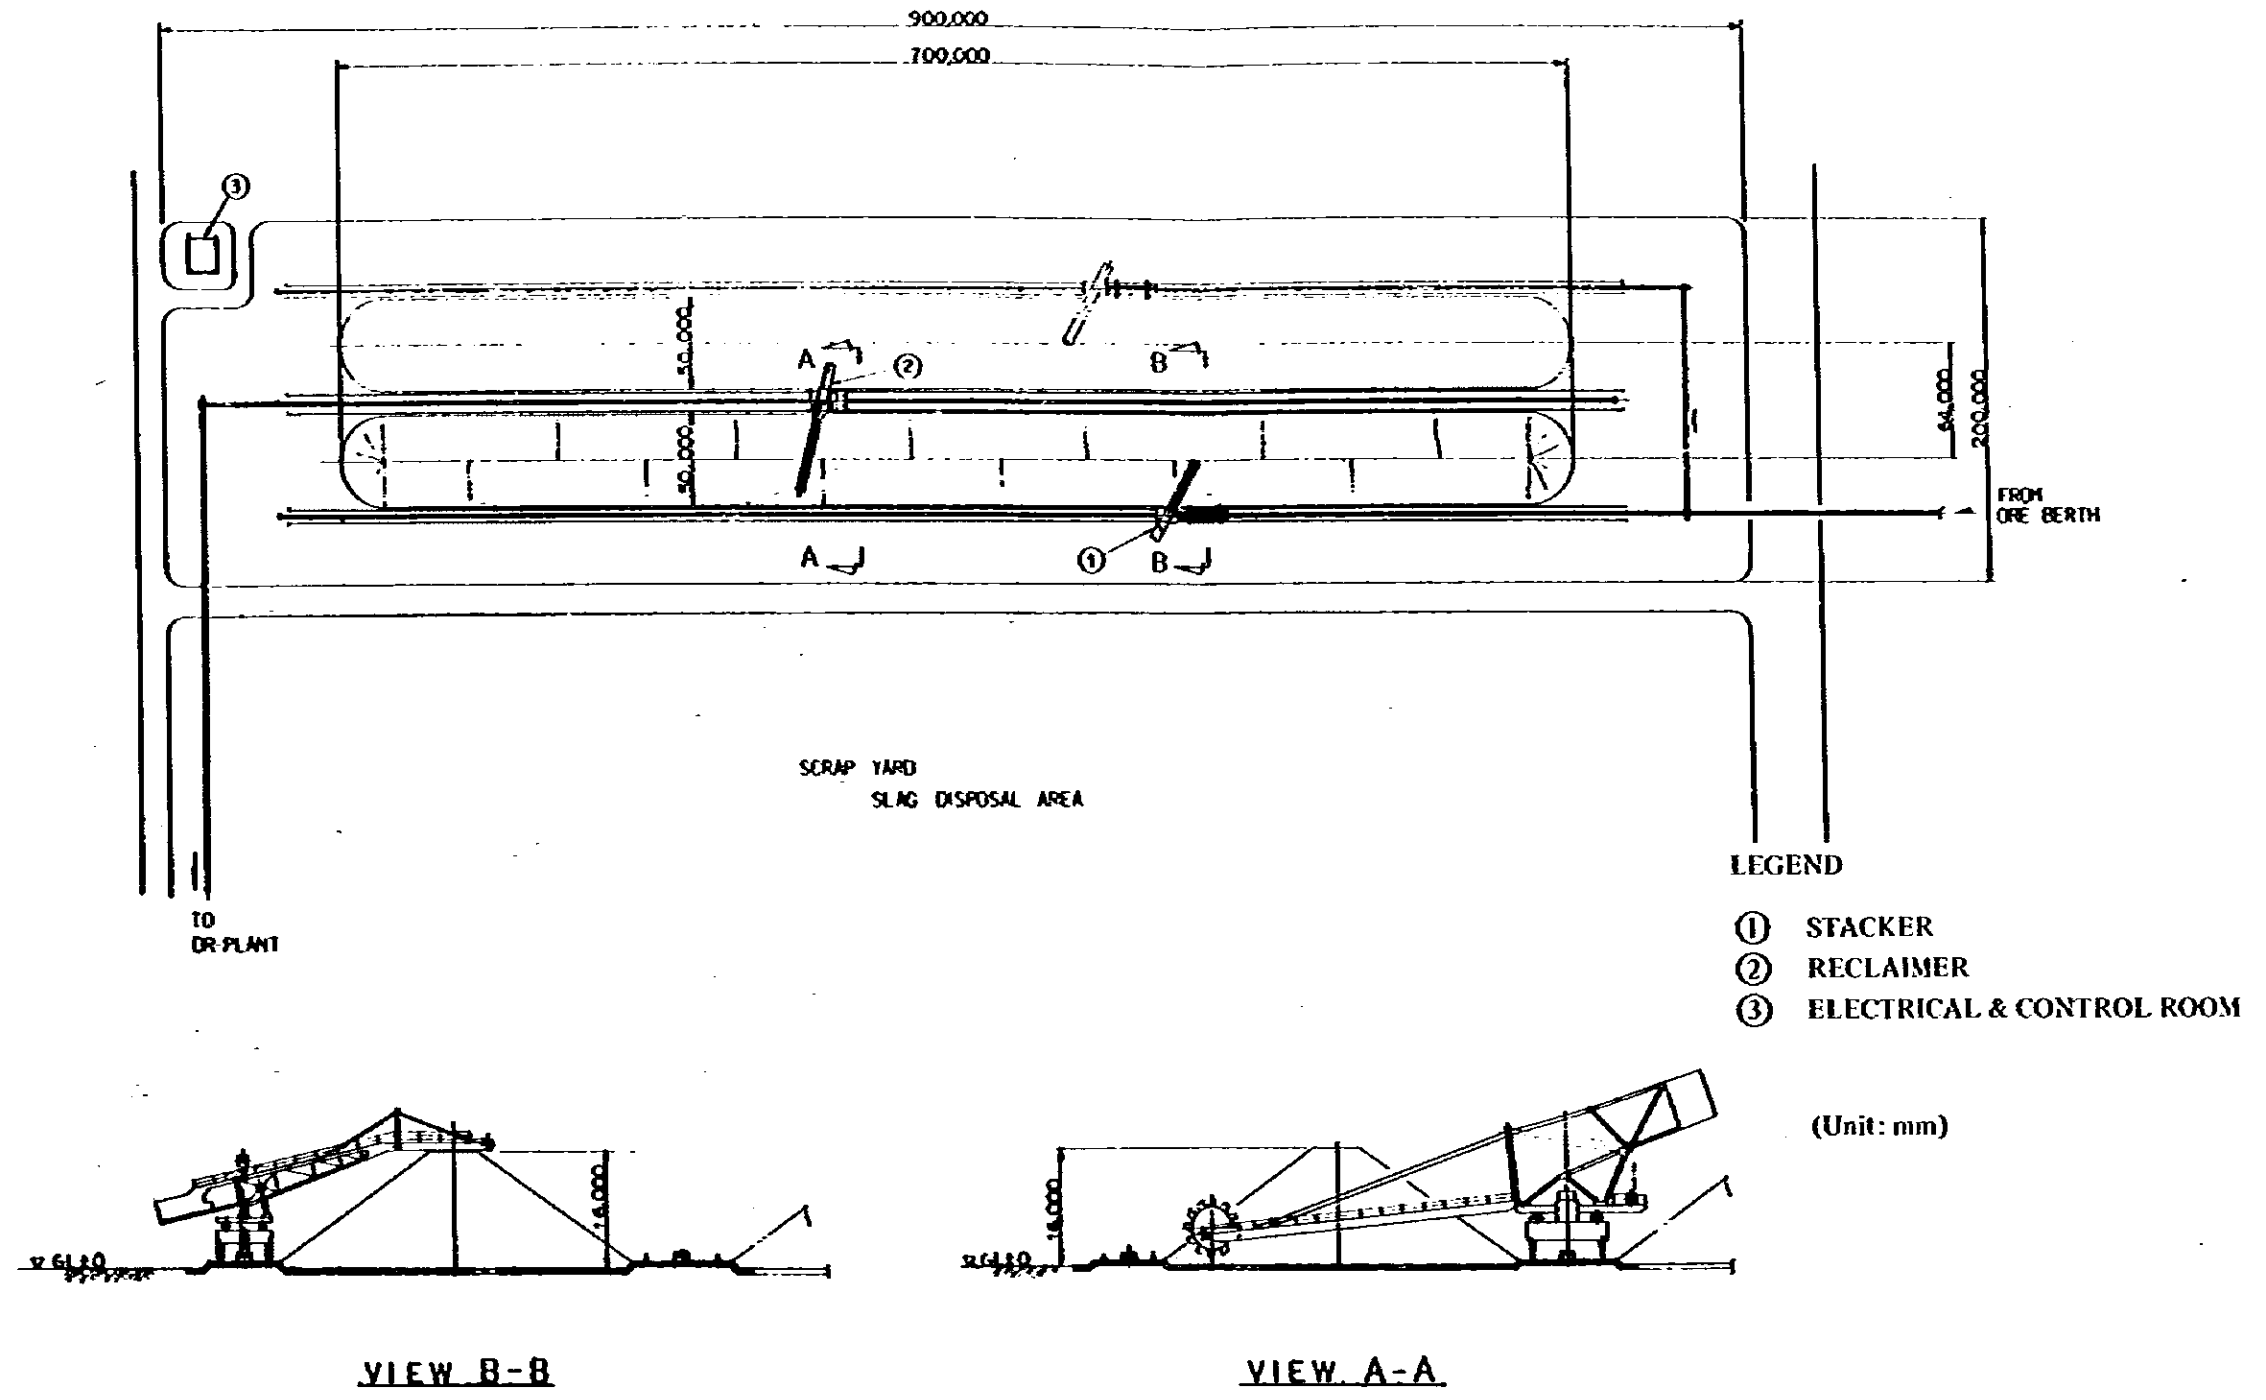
Layout of Raw Material Receiving and Handling Facilities
